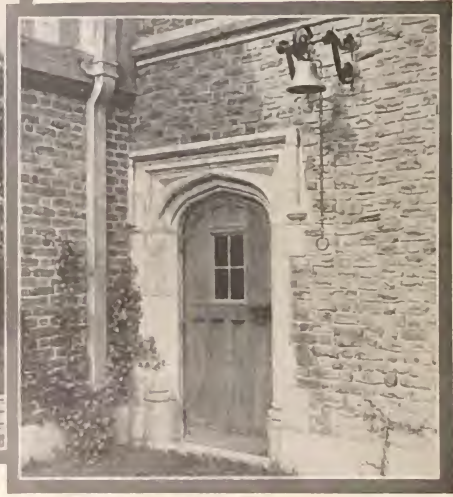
DETAIL OF GARDEN FACADE COURT LODGE GROOMBRIDGE KENT
